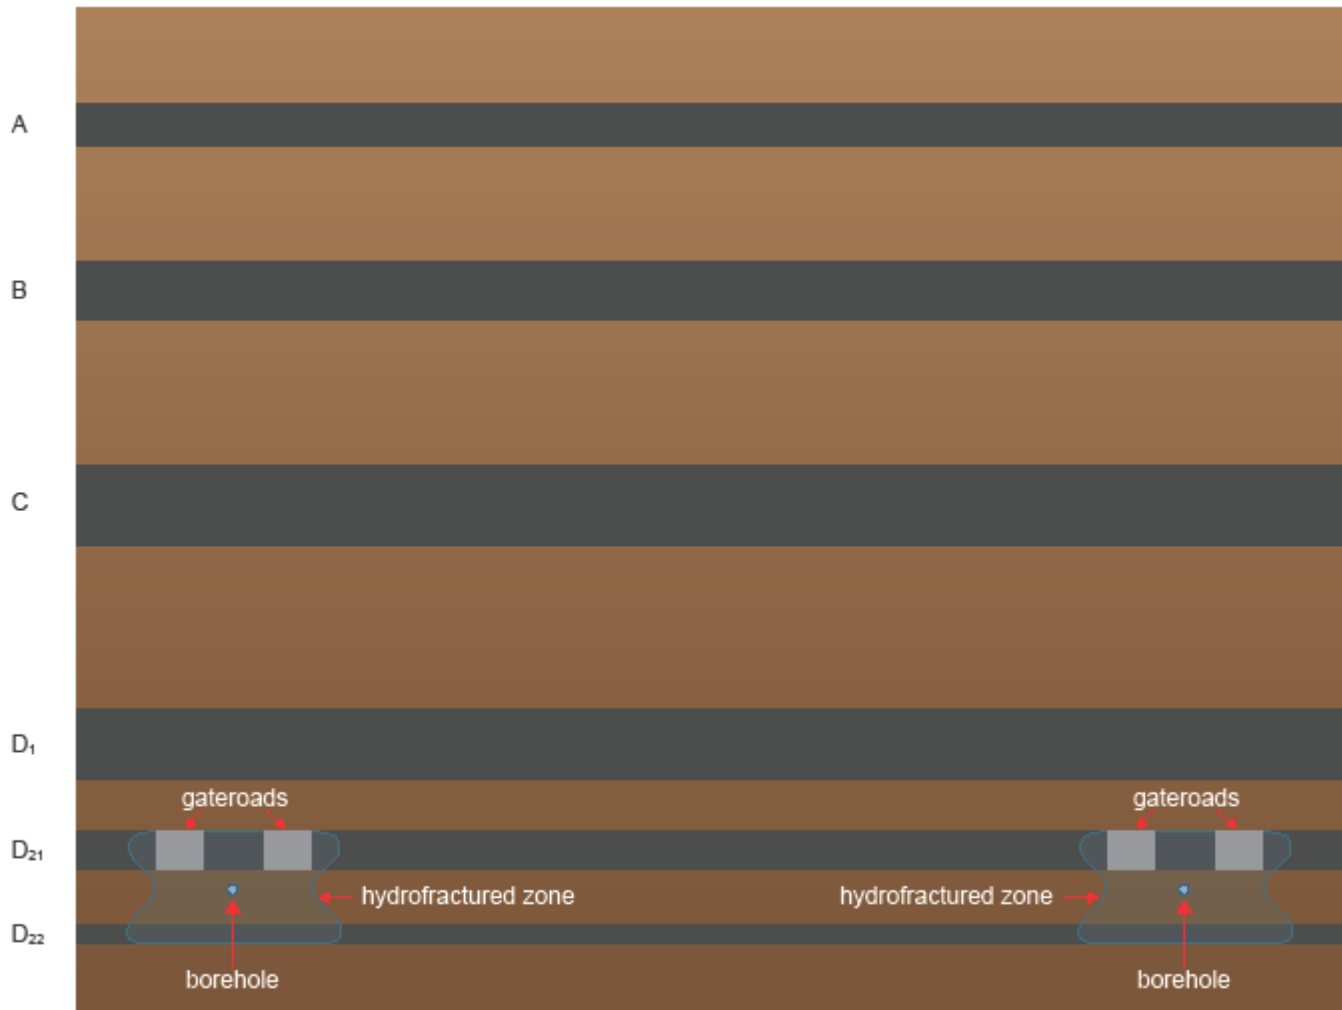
Drill and frac first seam from floor in area of gateroads – elevation. Also note Section A-A.
